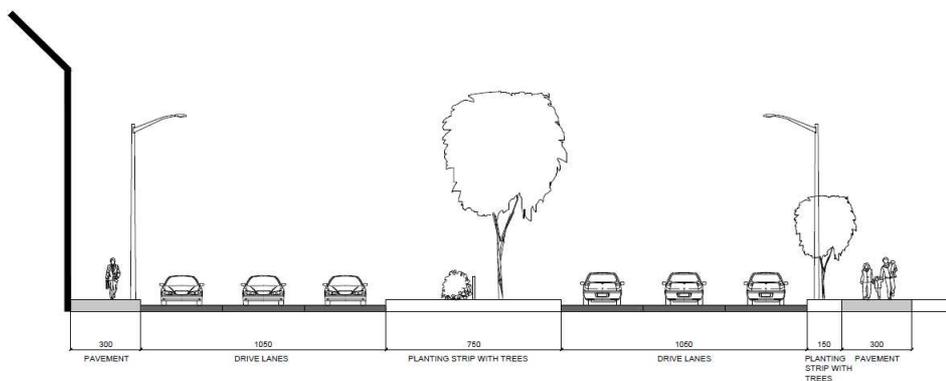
Street section – the national road no. 91 in Zgierz. Source: (Olczak, 2019).
